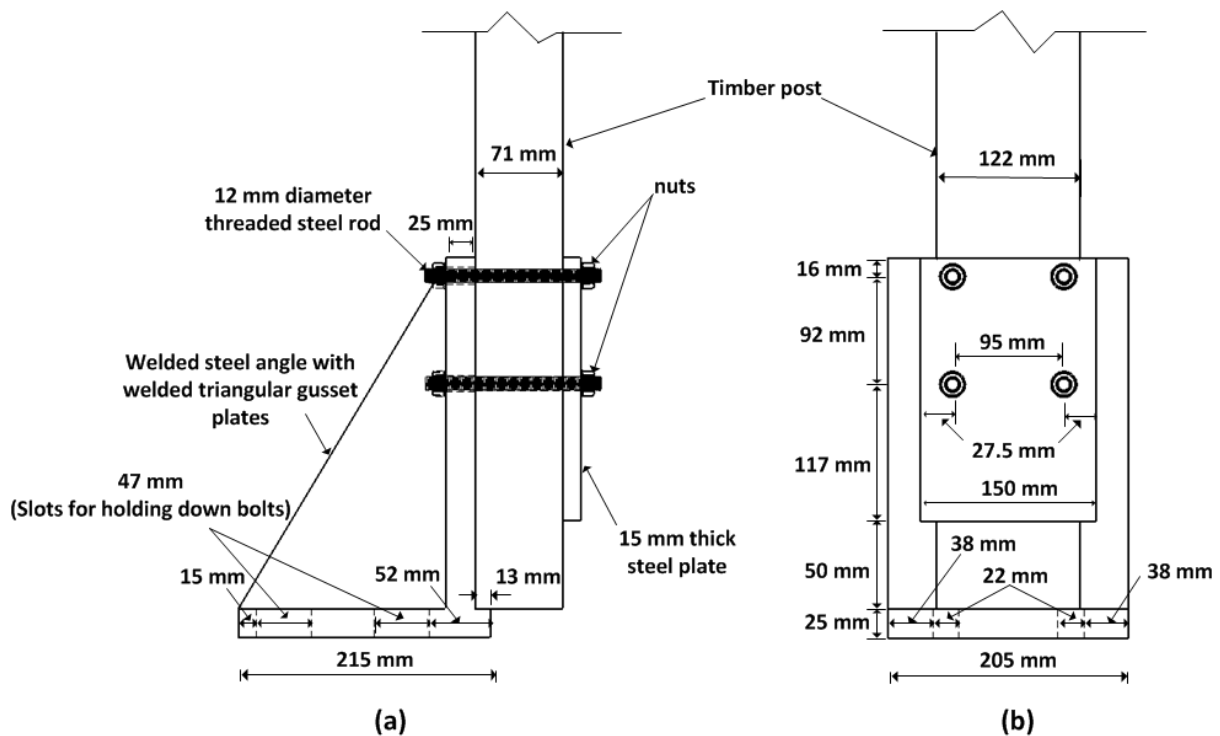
Details of the joint assembly at the base of the timber posts: (a) Side-view and (b) Front-view
